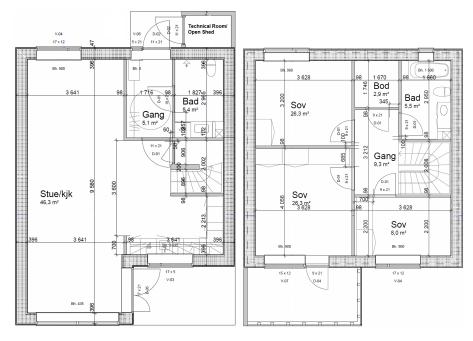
Building plan for ground floor (left) and second floor (right). Both houses share this building plan, but House B is mirrored and has an open shed by the entrance. (Mesterhus, 2013)
